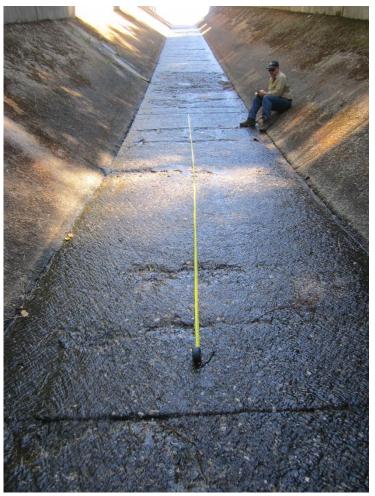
Bottom slab between Stations 5+75 and 6+00.
